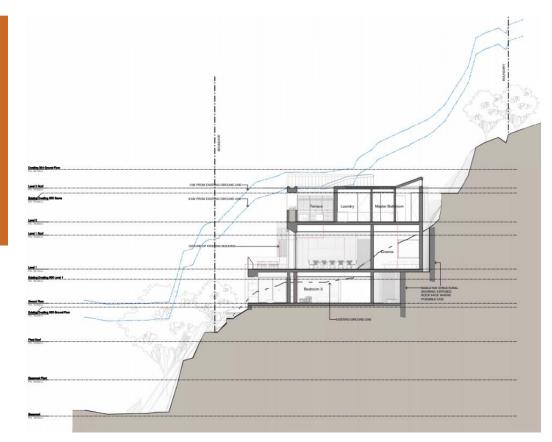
Proposed section 5, looking south, Extract from Sections Sheet 5 (Source: Drawing No. 3004, Rev. A)
